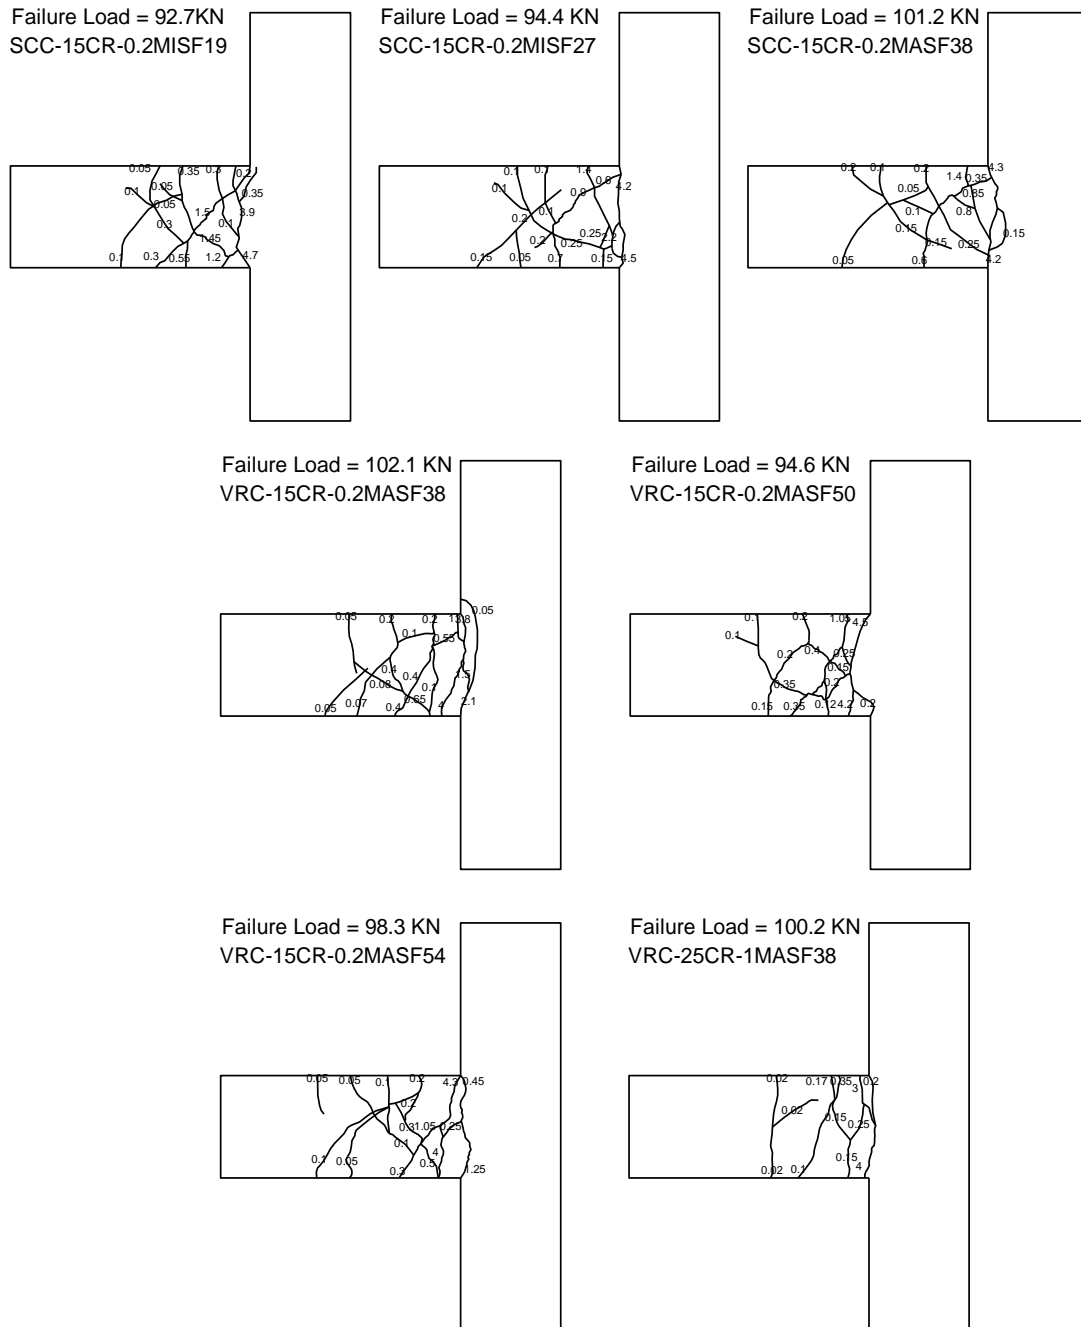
Cracking patterns for tested Beam-column joints
